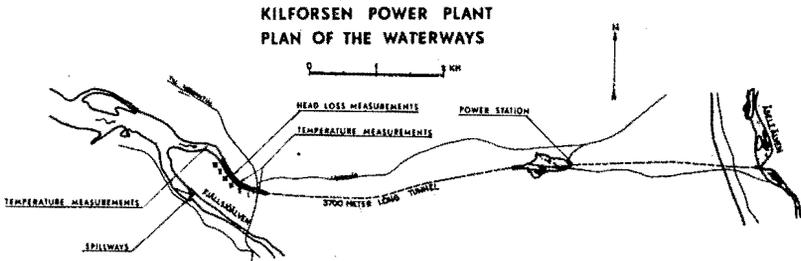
Plan of the Kilforsen Hydro Power Plant.
